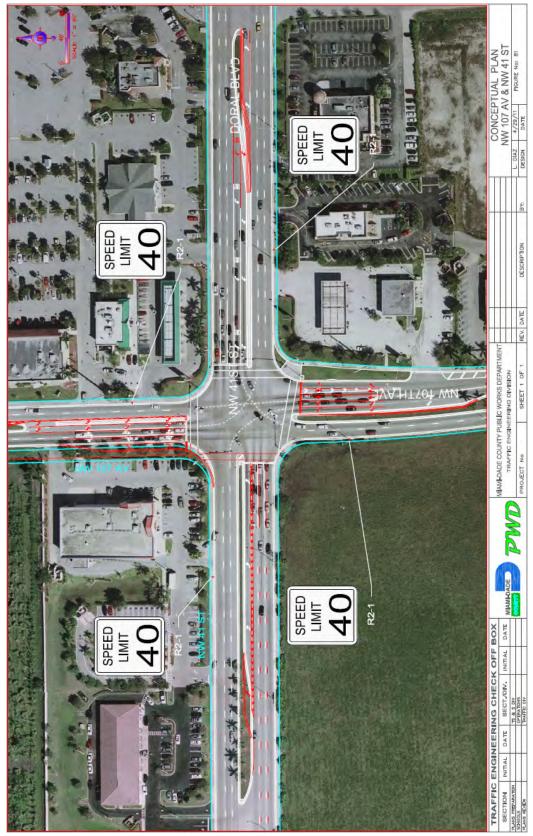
Conceptual Plan – NW 107 Avenue and NW 41 Street
